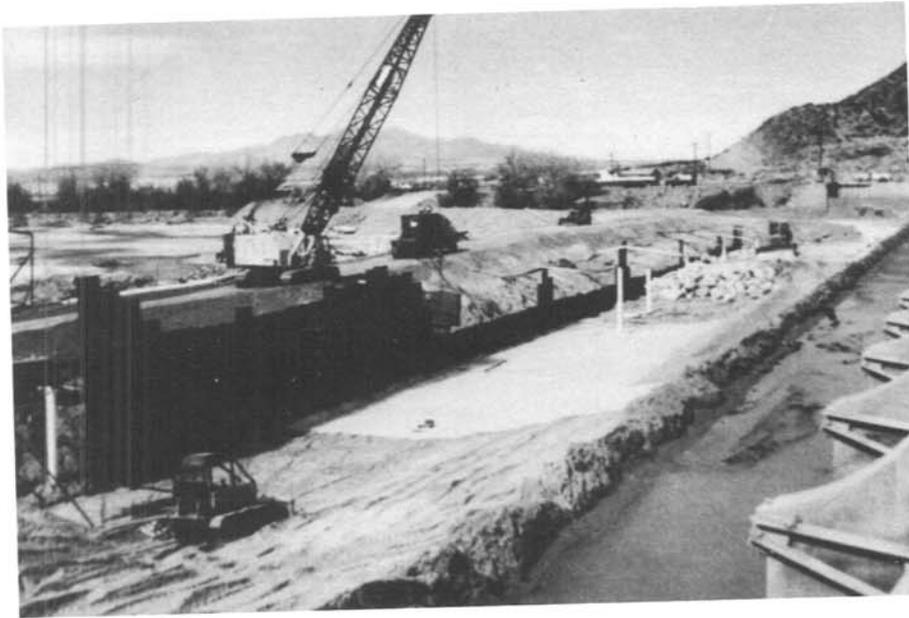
Work area as viewed from the diversion dam. Some dewatering wells have been relocated to allow for geotextile placement and bedding material (center of photograph). 7/27/89
